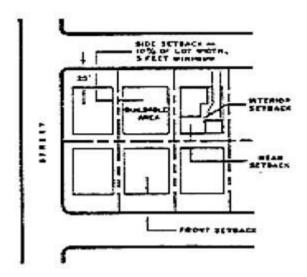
F: SETBACKS AND BUILDABLE AREA
